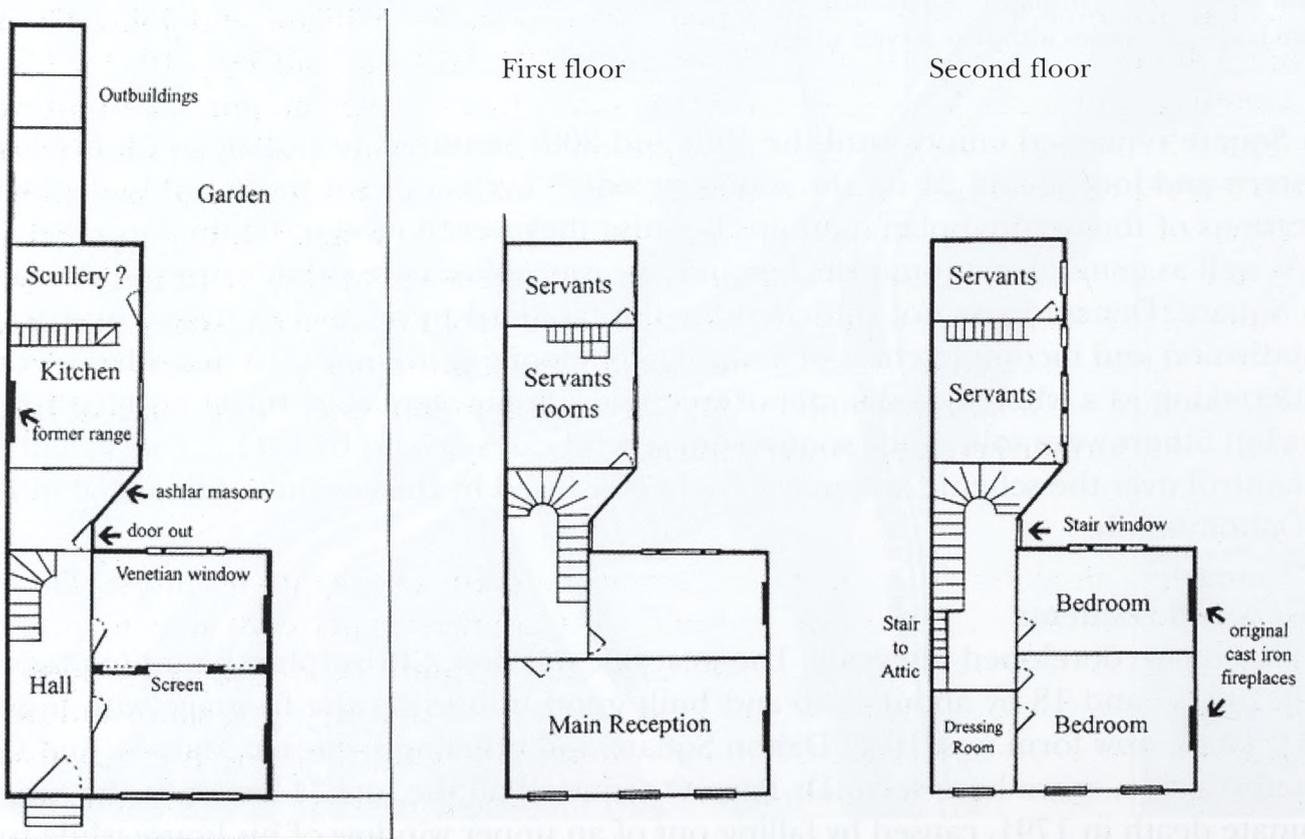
Plan of no.9 Dalton Square showing the rear service wing, very long stair window and screen arrangement between the ground floor rooms.
